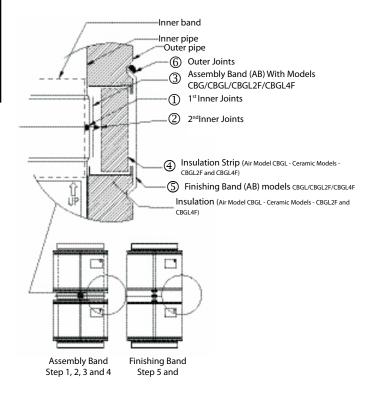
Assembled Models CBG / CBGL / CBGL2F / CBGL4F joint
